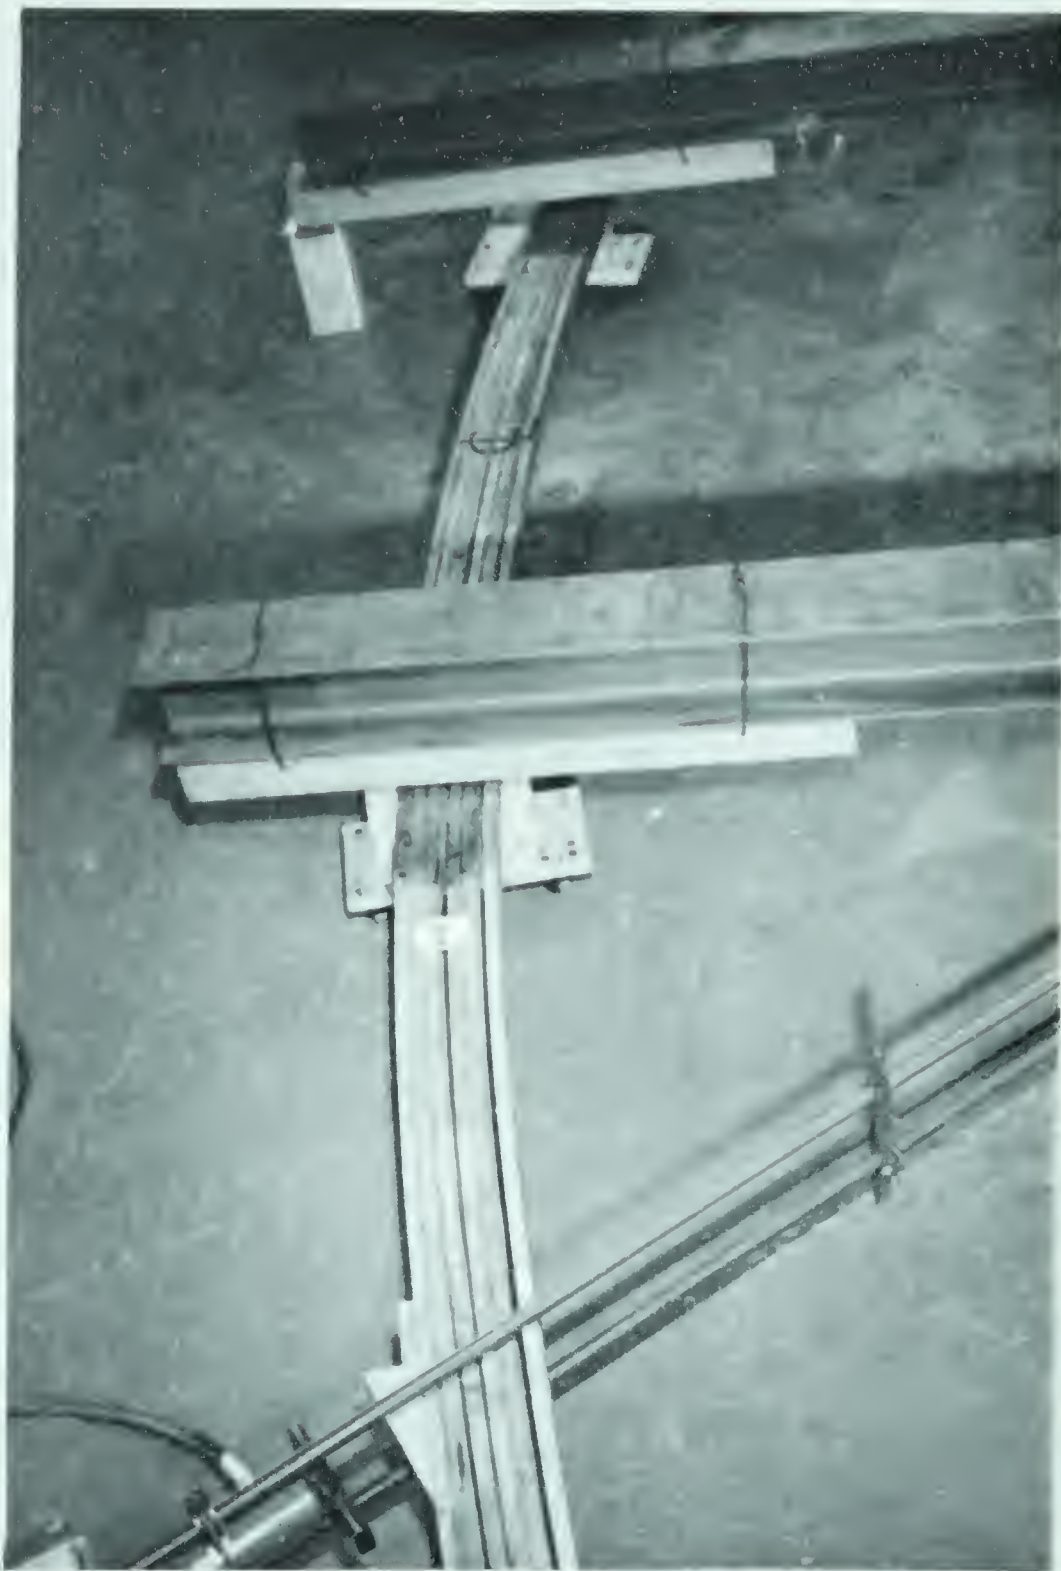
View of Failure in Arch Specimen No. 7.
